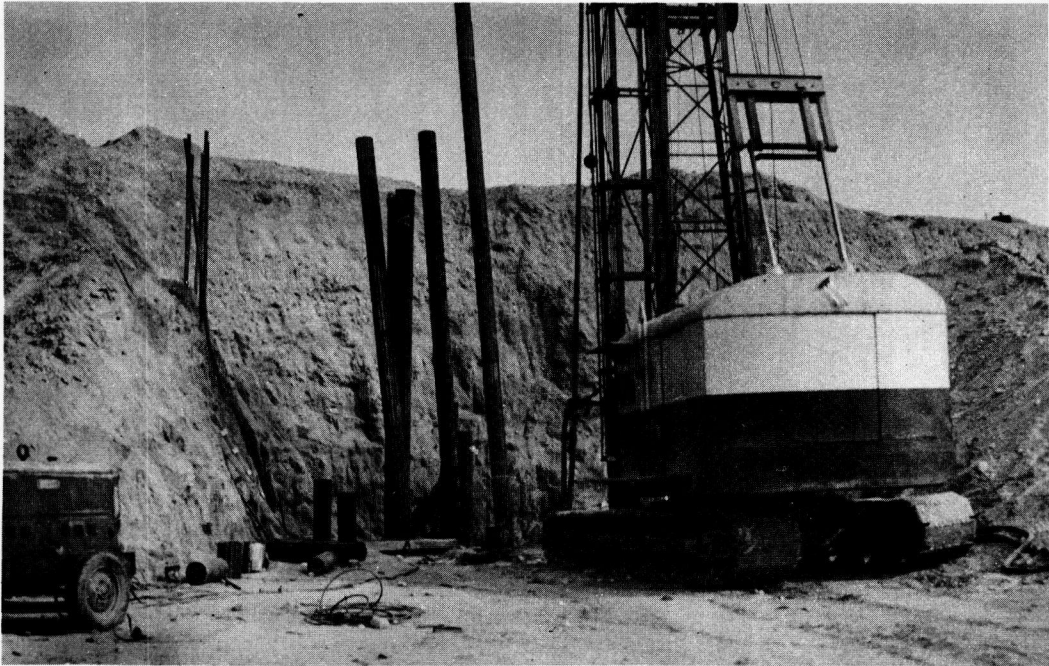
Pile test site during pile driving operations after excavation of embankment to elevation +13 ft.
